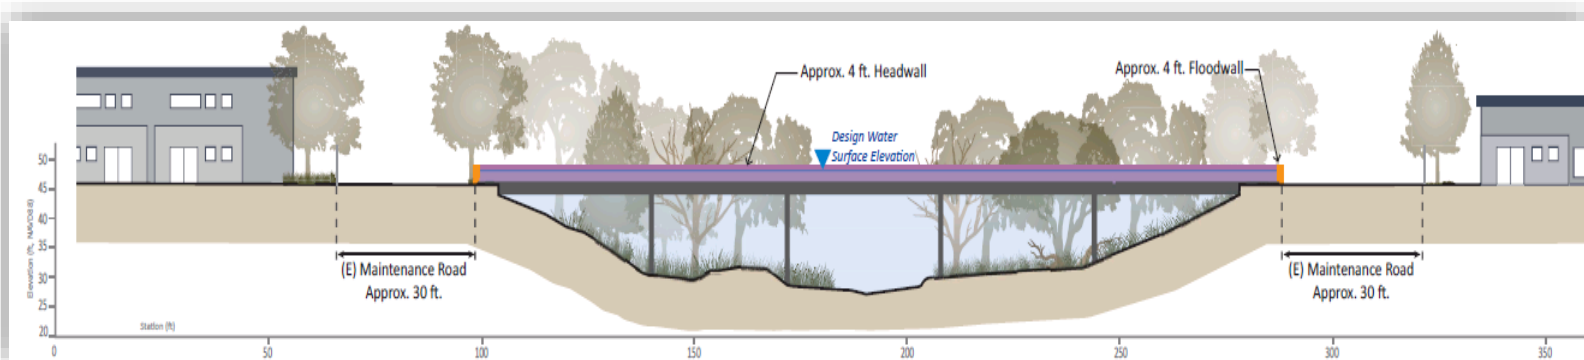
Reach 4 – Option A Cross-section: Headwall at Charcot Avenue bridge and floodwalls
